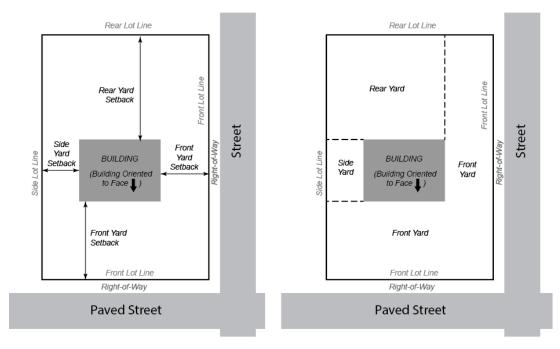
D: Typical lot lines and setback locations for a corner lot with the building oriented toward the narrow street frontage (left image) and typical yard locations (right image).
